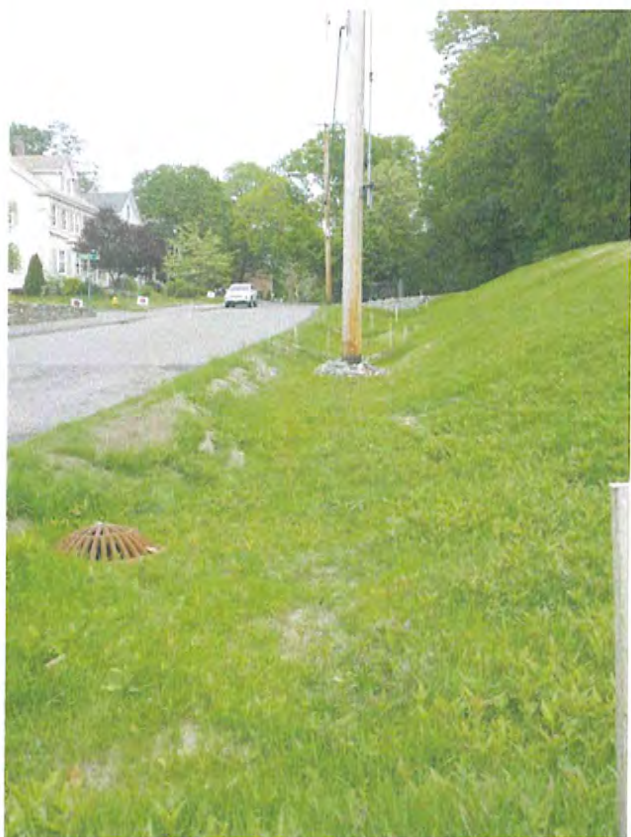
Outlet Structure at Avery Street to Dedham Drain System
